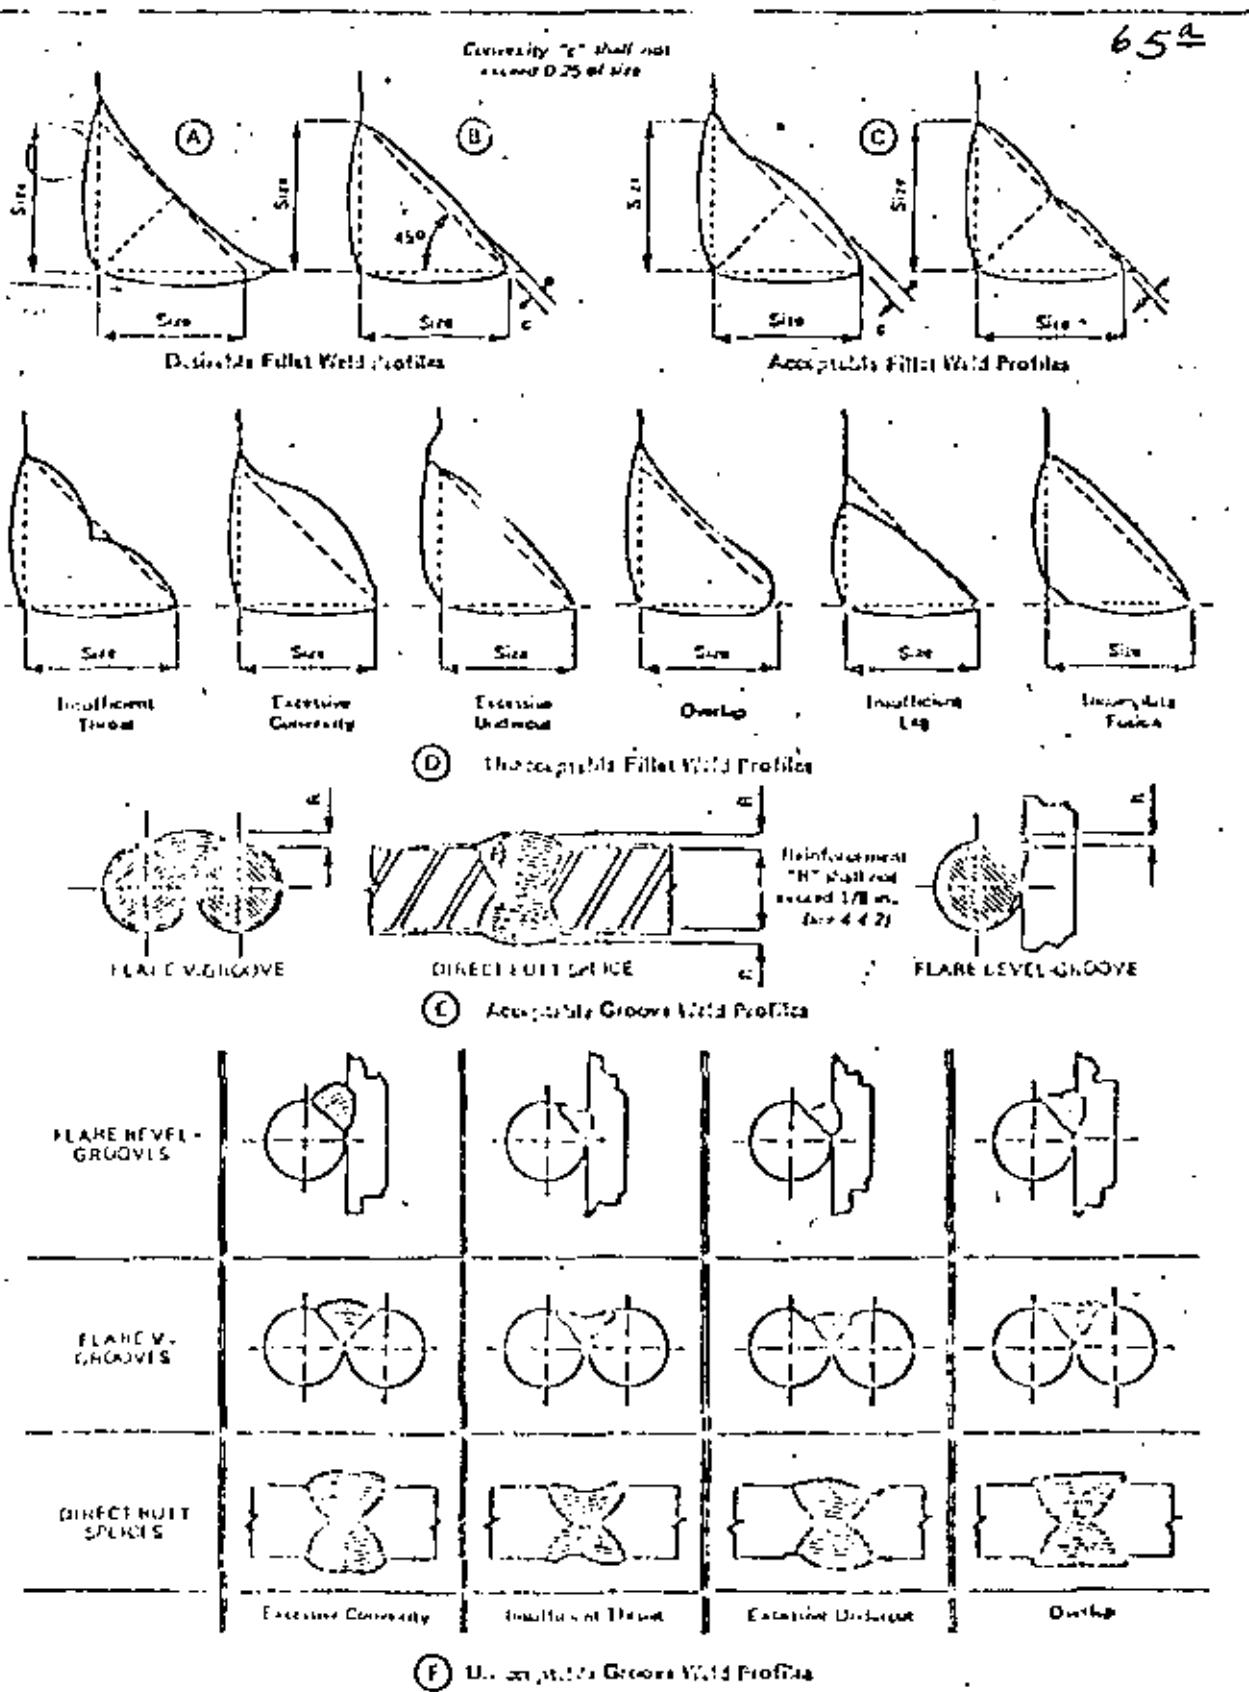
Acceptable and unacceptable weld profiles
